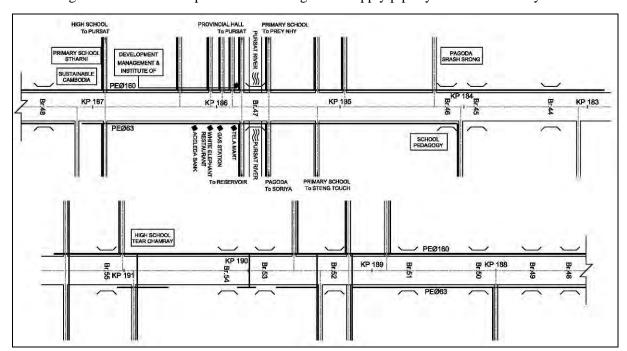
shows the plan of the existing water supply pipe system in Pursat city.
